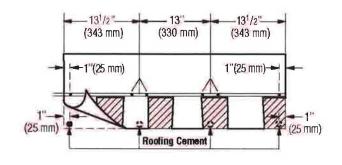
Use six nails and four spots of asphalt roofing cement on steep slopes.
